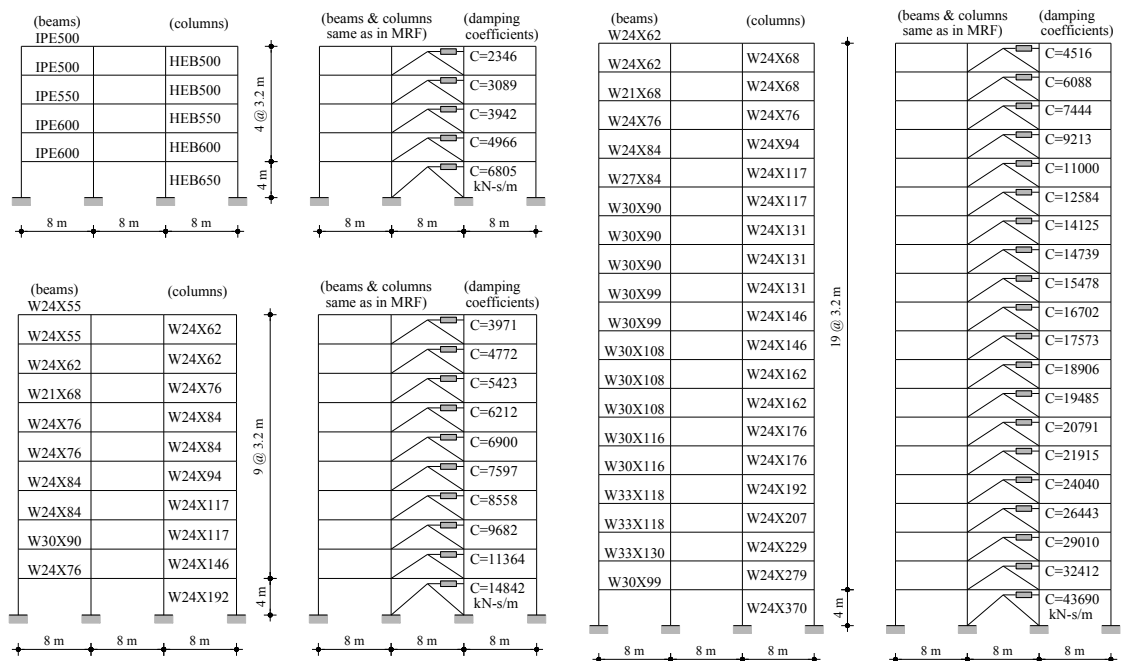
Elevation view and design details of the steel MRFs with and without viscous dampers
